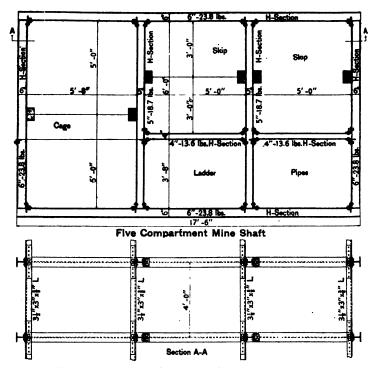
Proposed Five Compartment Steel Framed Mine Shaft.
